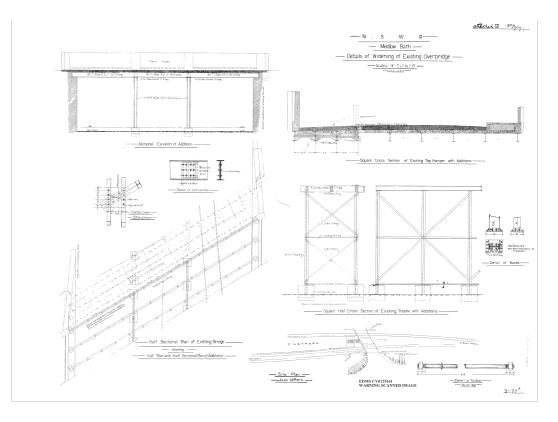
1913. Details of Widening of Existing Overbridge Source: Transport NSW
